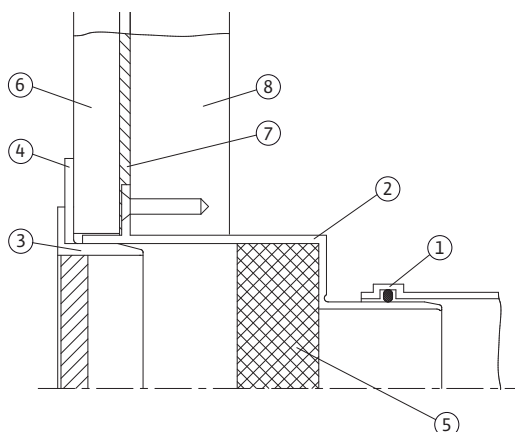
shows a cross-section through the finished wall-mounted installation around the ventilation insert. If ventilation is through the roof, the ventilation insert and the active carbon filter are not required.
